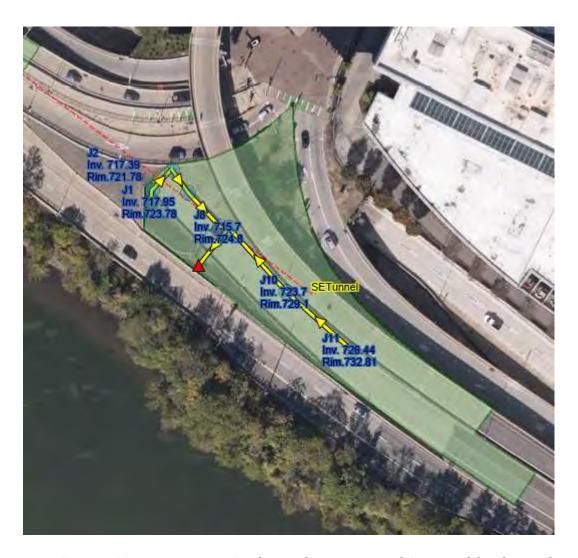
Drainage area Southeast of Ramp D Tunnel Accounted for Flow to the Big Bathtub.
